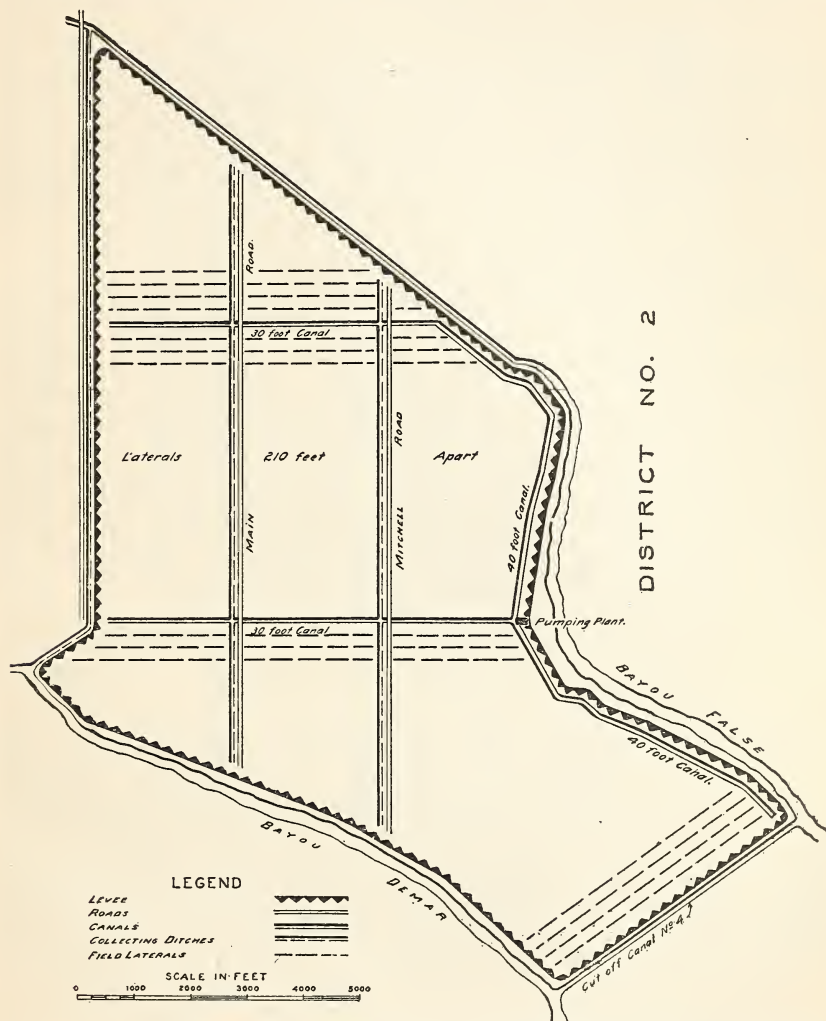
Map of Drainage District No. 3, near Raceland, La Fourche Parish, La., outlining arrangement of ditches and levees.
